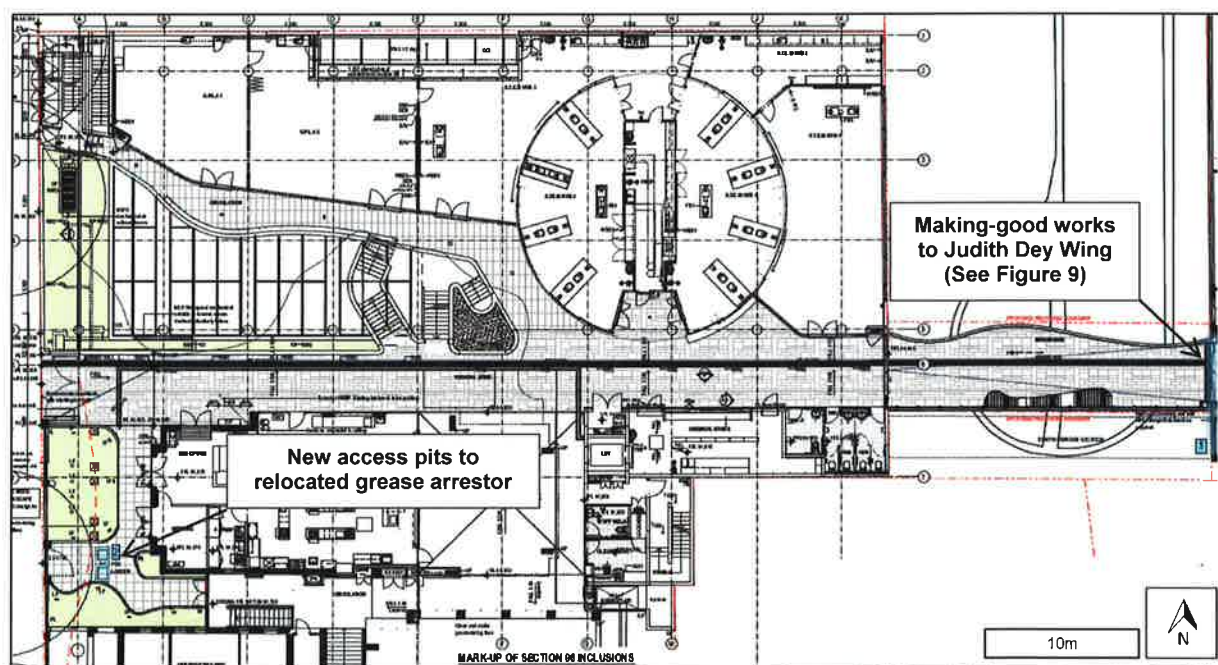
Extract from proposed level 4 floor plan (source: Application documents, 2018)
